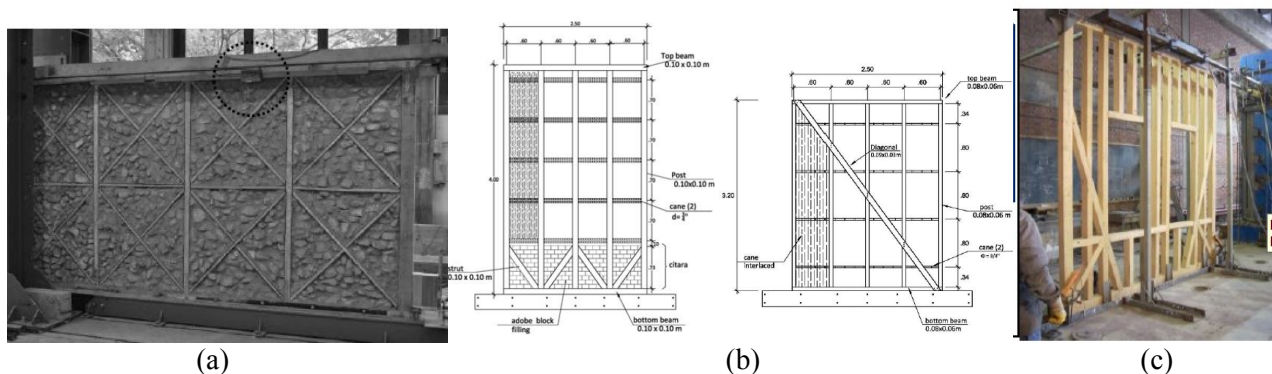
Timber frame walls: (a) system used in the reconstruction of Haiti [25]; (b) *quincha* walls [26]; (c) timber frames characteristic of himis construction, Turkey [27].
